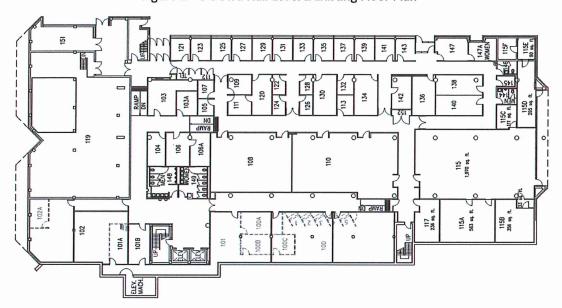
O'Dowd Hall Level 1 Existing Floor Plan
